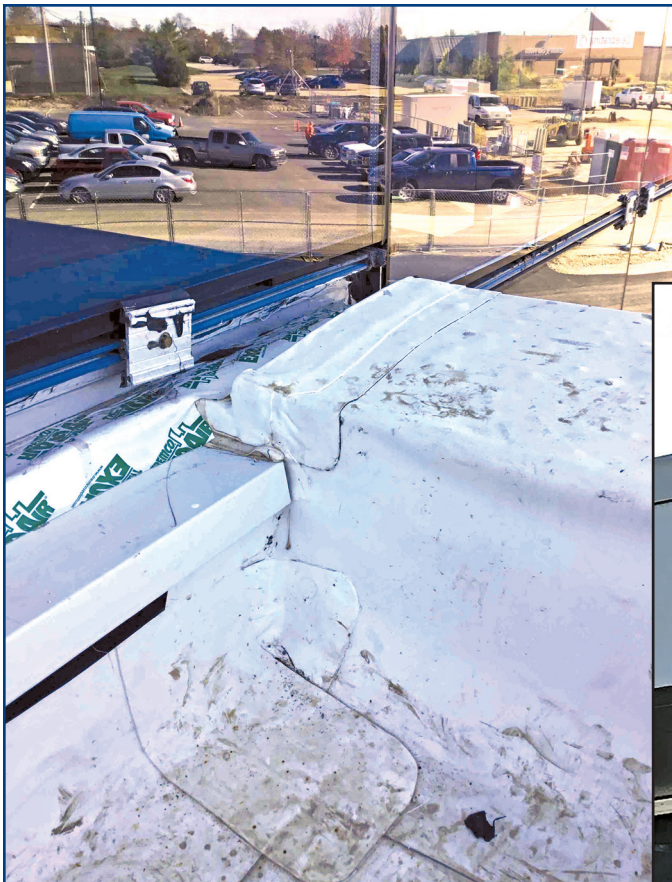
A thermoplastic polyolefin-clad parapet wall transition to aluminum curtainwall sill condition.
